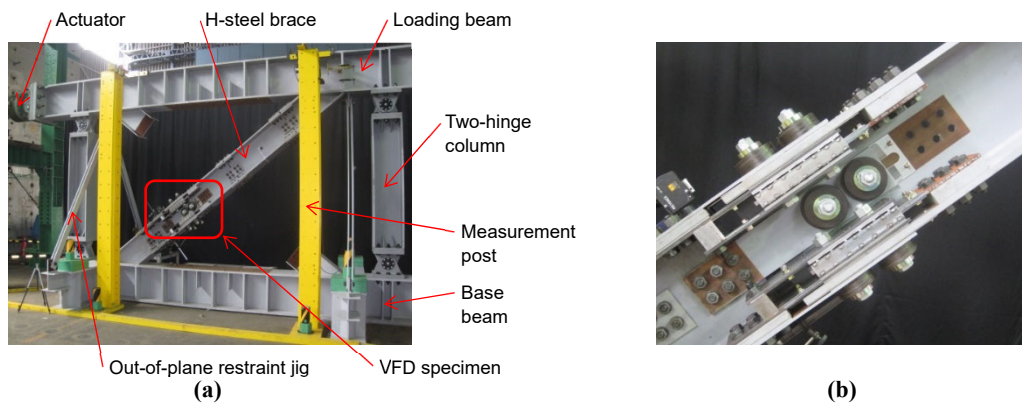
Photographs of the full-scale testing setup: (a) dynamic loading system⁴⁴; and (b) variable friction damper (VFD) specimen
